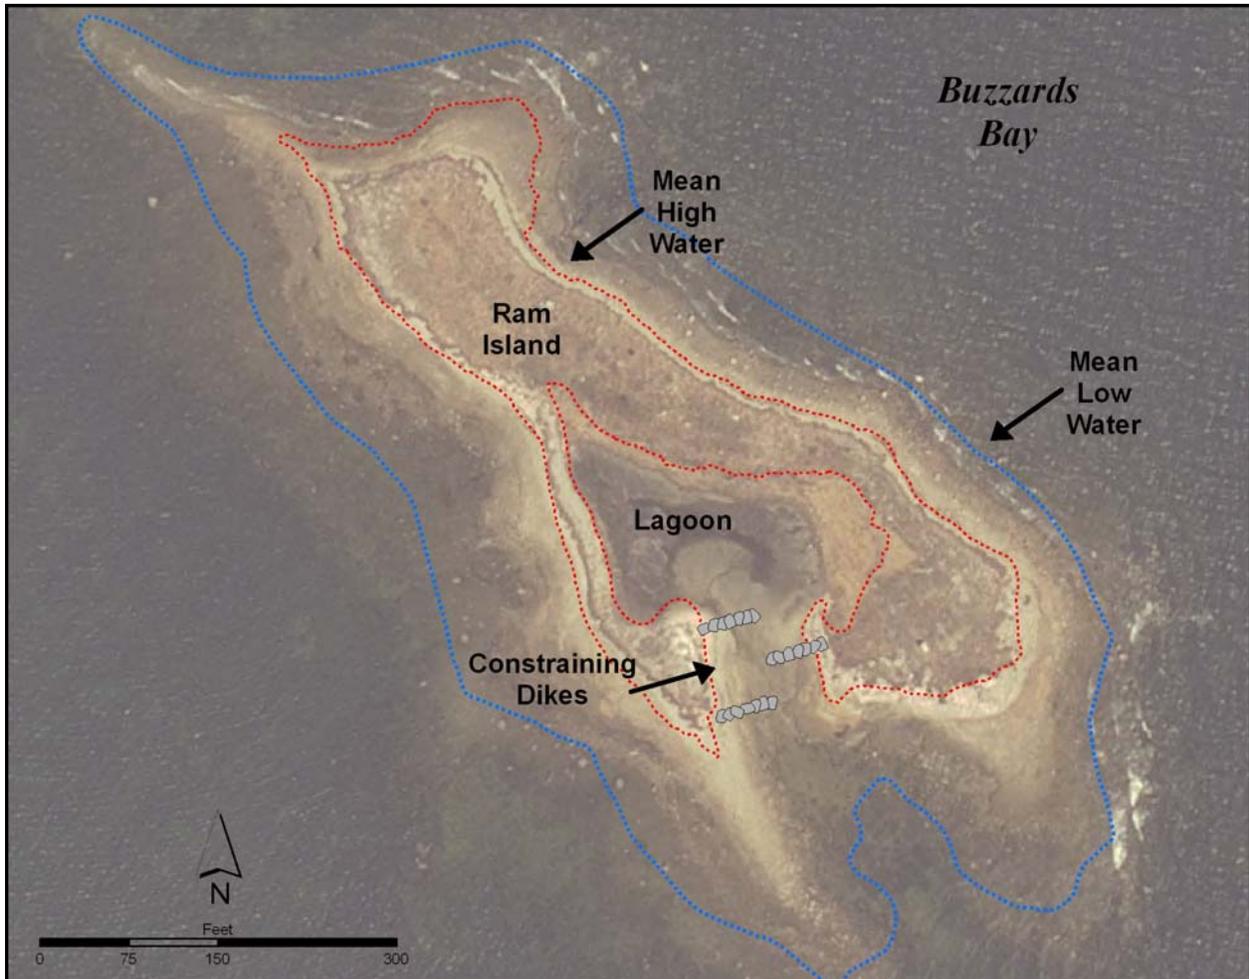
Constraining dikes protecting the inner lagoon on southwest side of Ram Island. Stone dikes will constrain tidal channel into the lagoon area protecting the area from wave intrusion.
